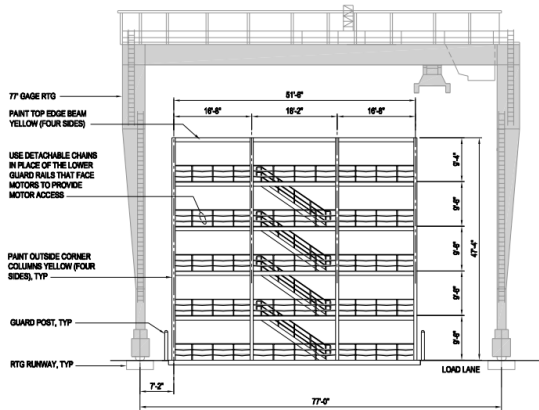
Typical Arrangement Details of Reefer Stacks
